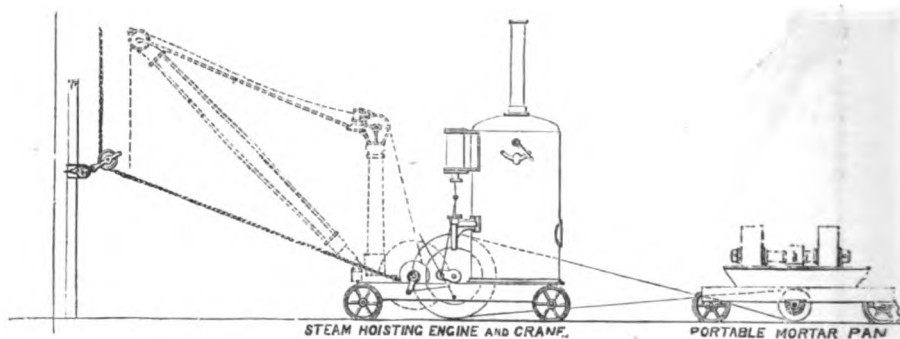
Elevation of No. 13 HOISTING ENGINE (or STEAM CRANE) with Patent Frictional Gearing, and Mortar Mill attached.
